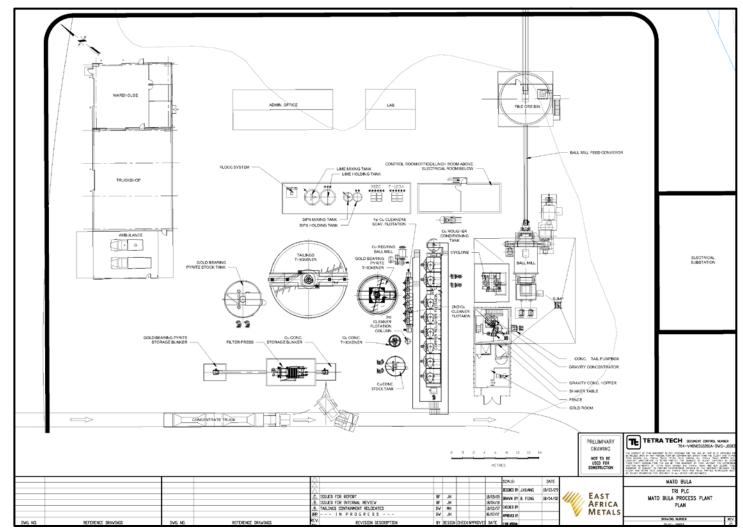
Mato Bula Conceptual Plant Site Layout
